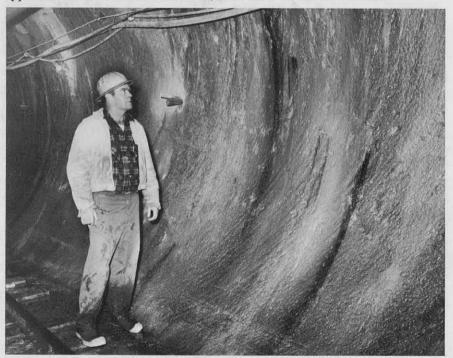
Southwest wall of the Mole-driven tunnel at sta. 510+50, showing bedding in the Cambridge argillite.
